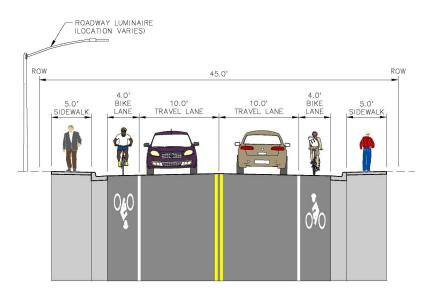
W. 30th Ave. (Spenard Road to Arctic Blvd.) - Alt. B
